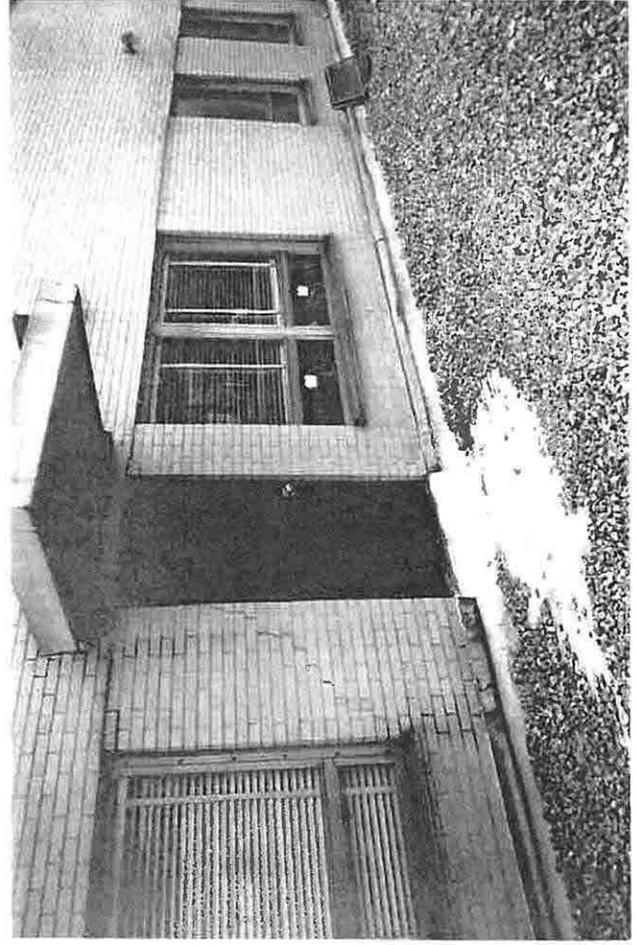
3rd Floor Above Roof for the 2nd Floor Parapet Wall
